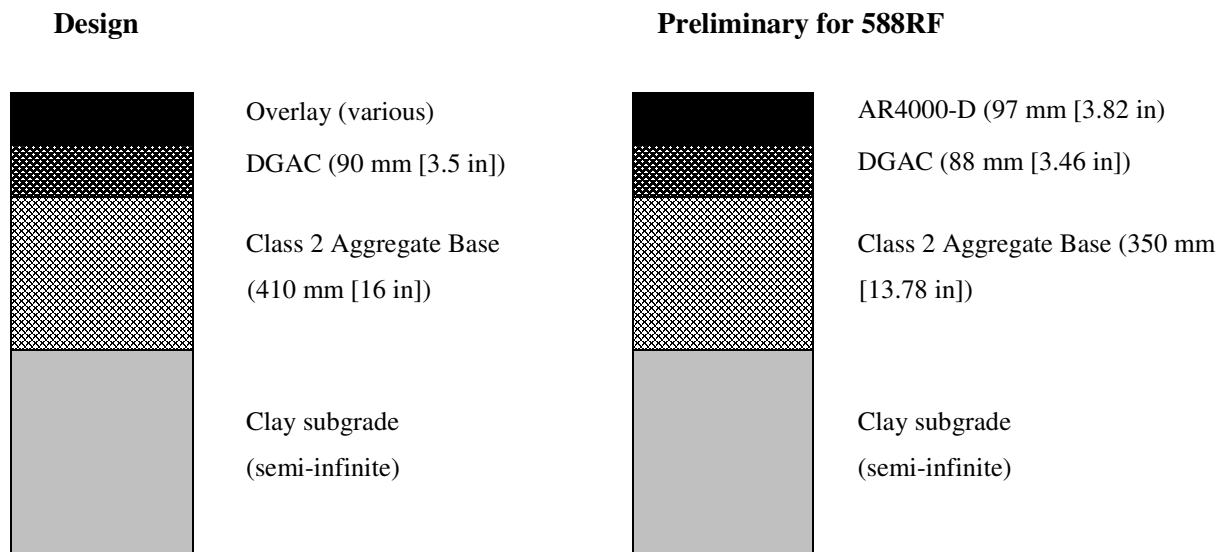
Pavement design for the Reflective Cracking Study test track.
